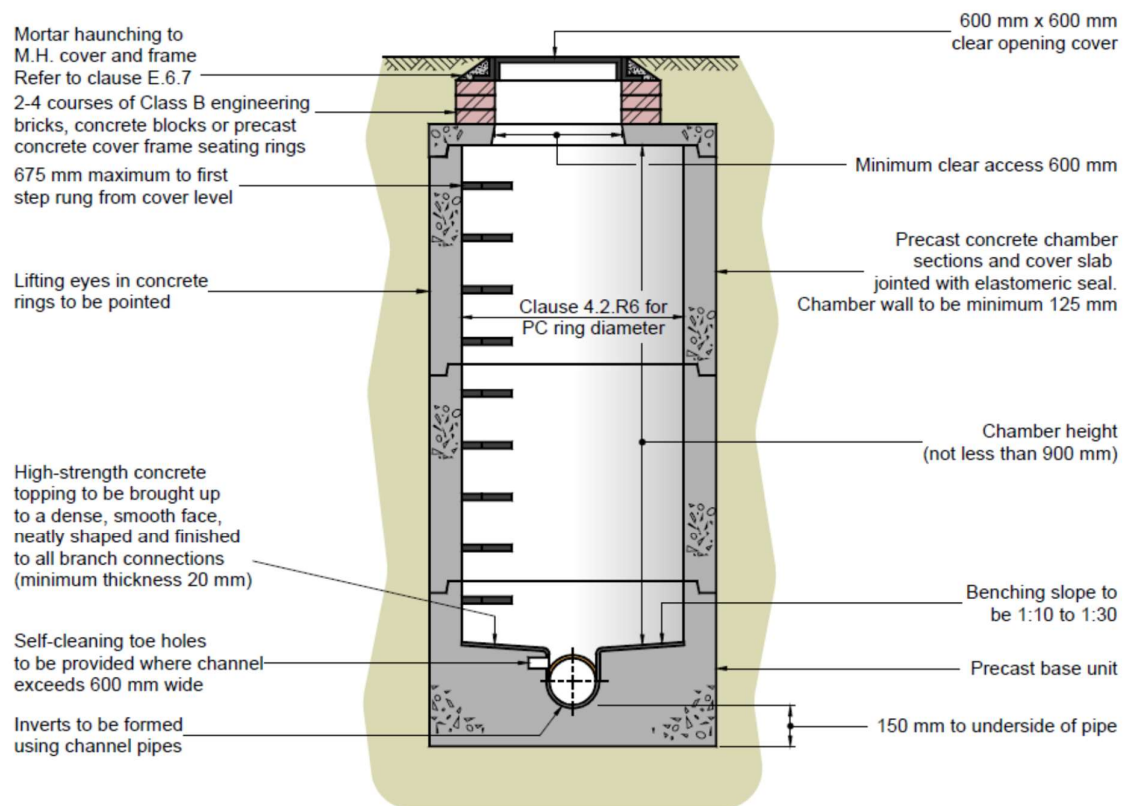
Typical manhole detail (DEFRA, 2011).
